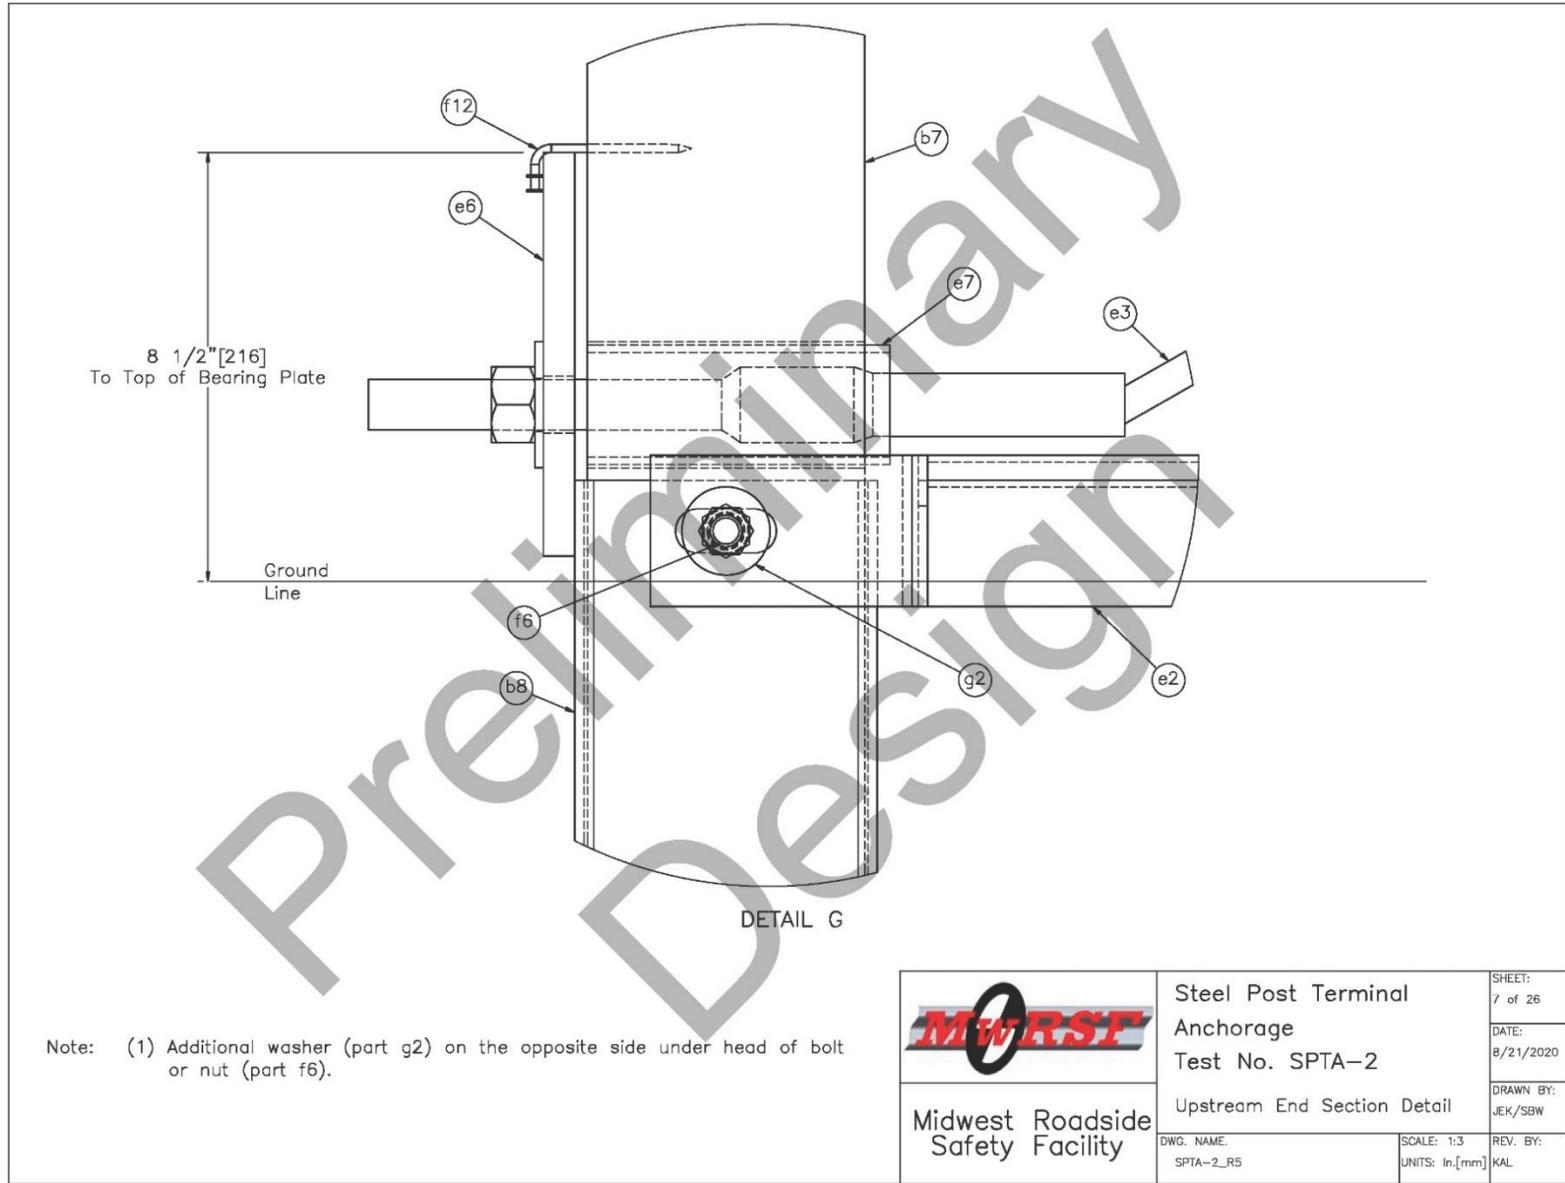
Upstream End Section Detail, Test No. SPTA-2
